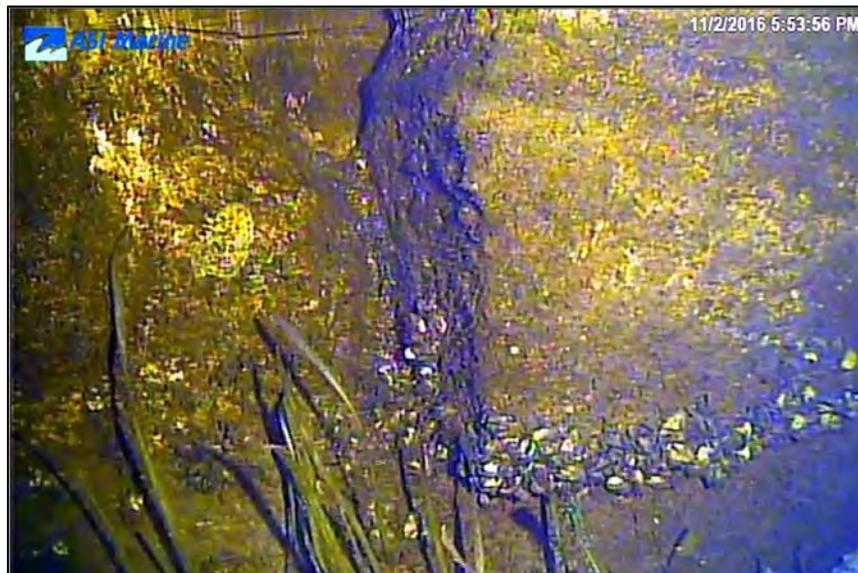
Spalling observed in line with a vertical joint at 88.2 m
